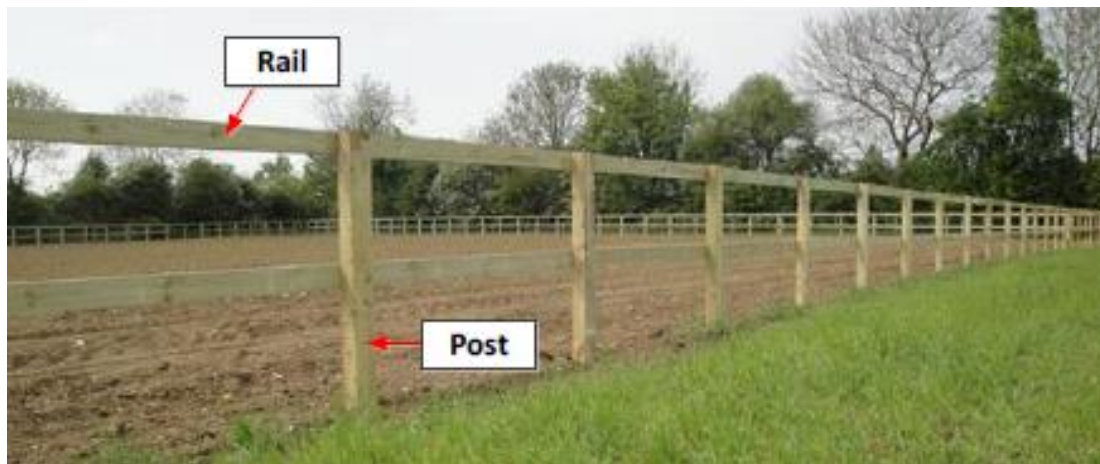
Image of a typical equestrian timber post and rail fencing system
